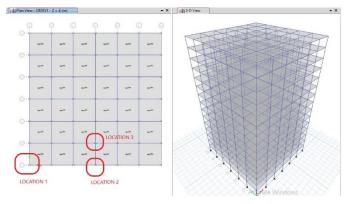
Sample plan view and 3D view of Model A building with 3 locations where the columns are removed
